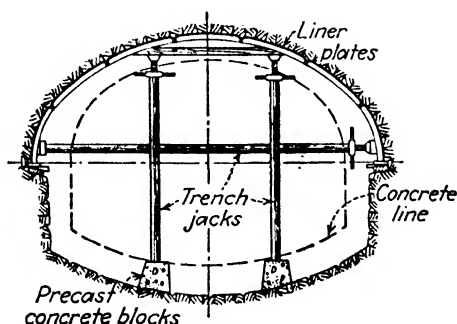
Liner plates supported on precast concrete blocks, later buried in the invert concrete.
